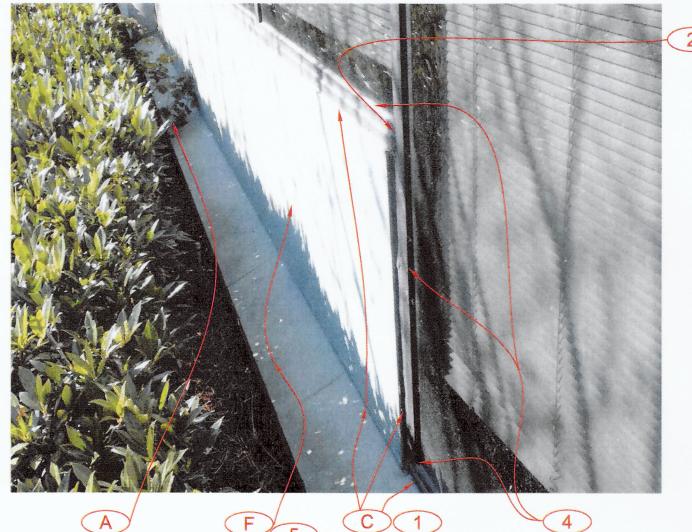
PHOTO STUCCO WALL TO WINDOW SCALE: NOT TO SCALE D1.01
